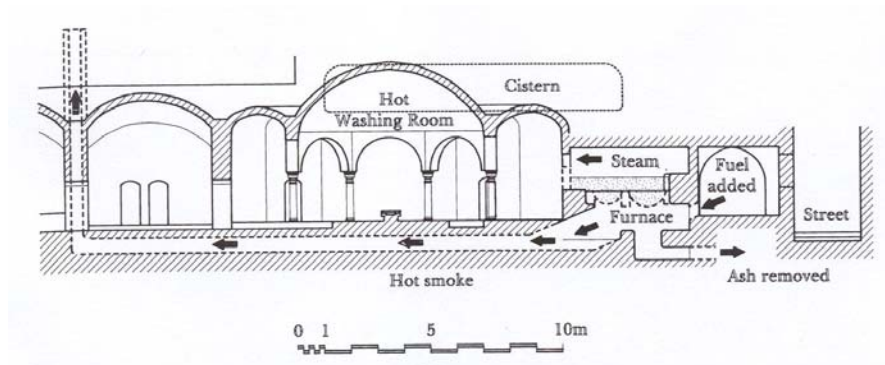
Section showing typical heating arrangements at Hammam al-Basha (Dow 1996)
